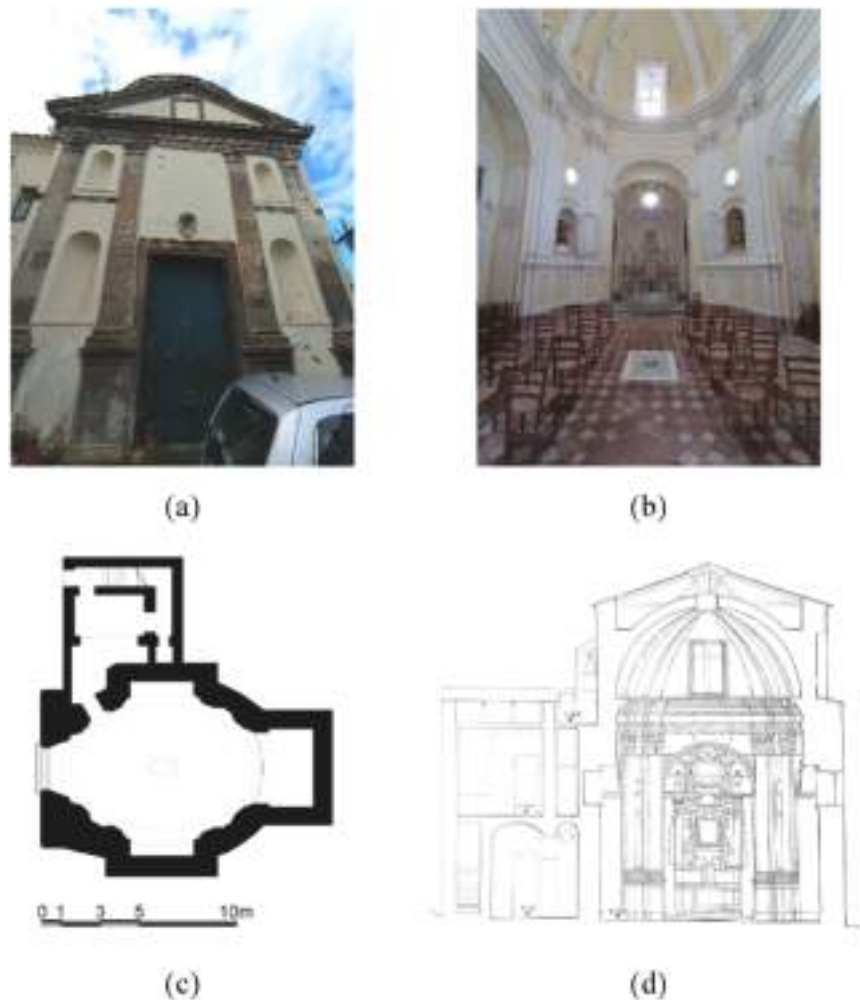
Photographic documentation of the church of *Saint Maria de Restilianis*: a) Main façade; b) Nave; c) Ground floor layout; d) Cross-Section.
